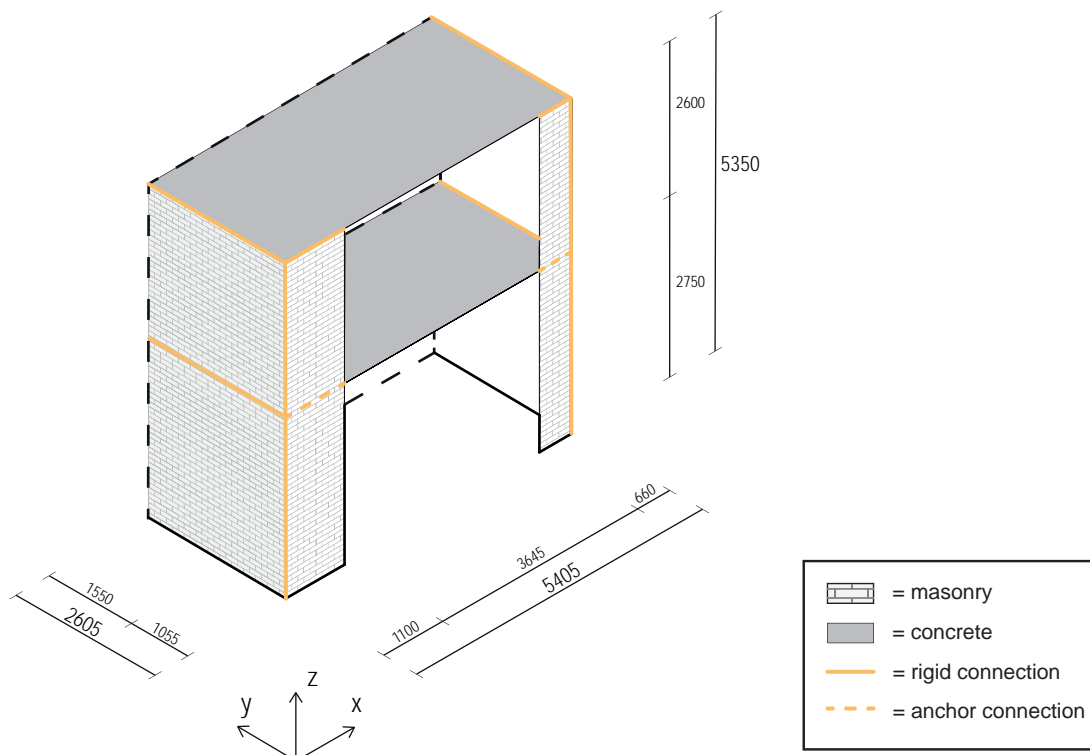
Modelling of the floor to wall connections of the two-storey building model.
